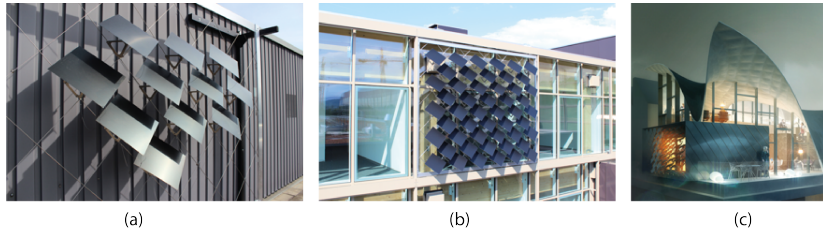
Constructions of the Adaptive Solar Facade (ASF): (a) ASF constructed at the HPZ building, (b) ASF constructed at the House of Natural Resources, (c) ASF to be constructed at the HiLO building at NEST
